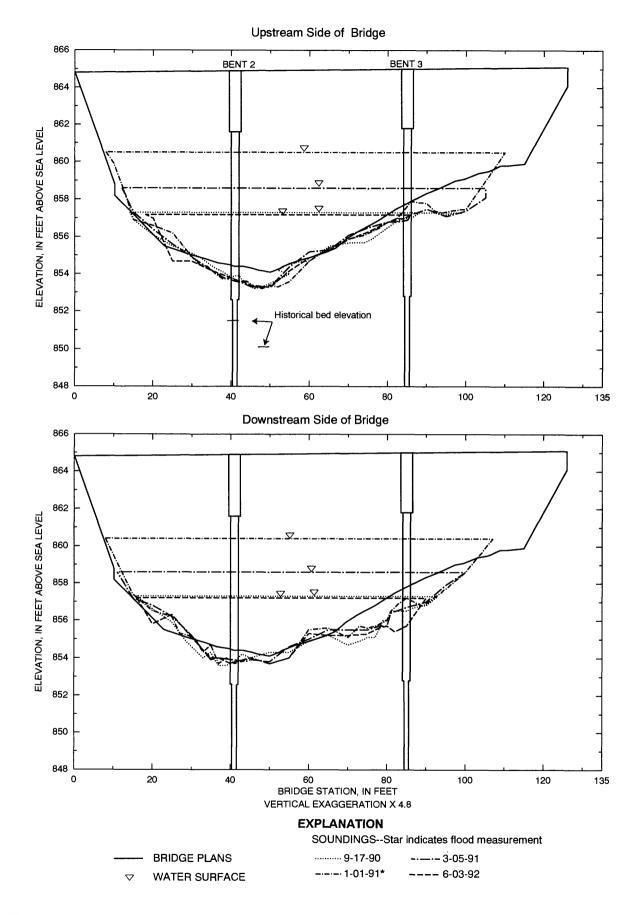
Cross sections showing bed elevations from bridge plans and soundings, State Road 9 over Pigeon River at Howe, Indiana.
